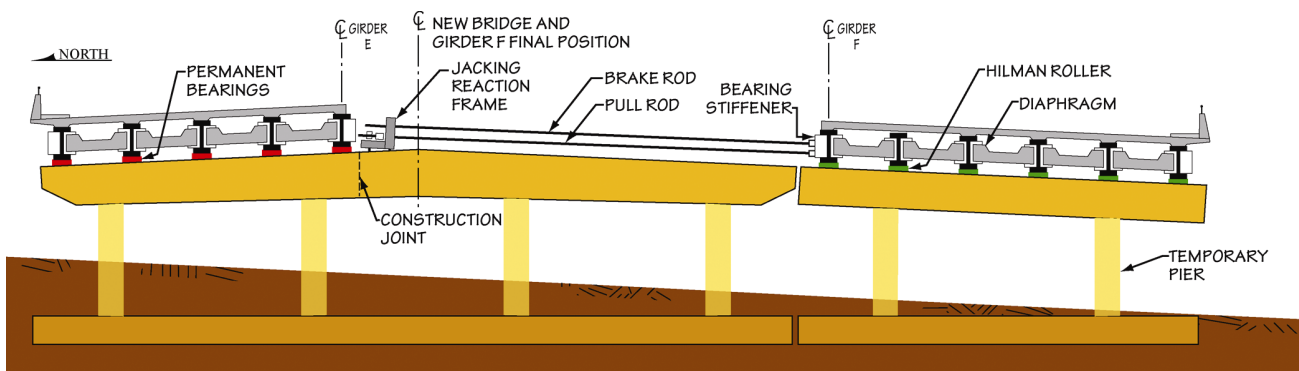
A schematic of the system for bridge jacking and rolling, with the south half-superstructure shown on the temporary pier before rolling it.
